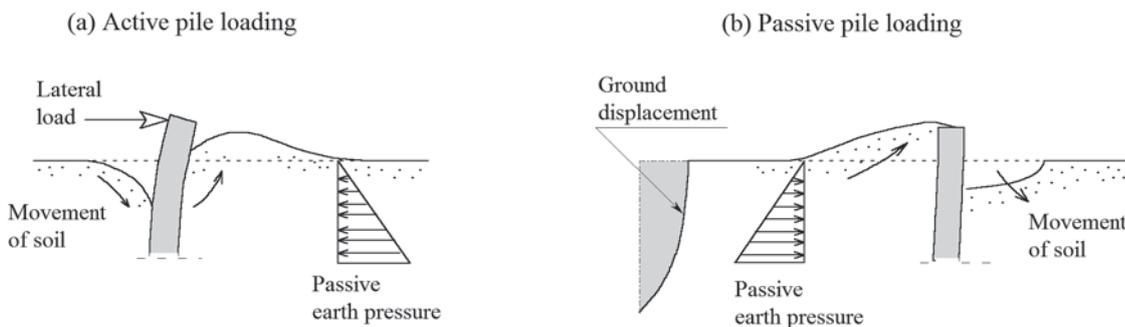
Schematic illustration of lateral loading of piles: (a) Active-pile-loading; (b) Passive- pile-loading
